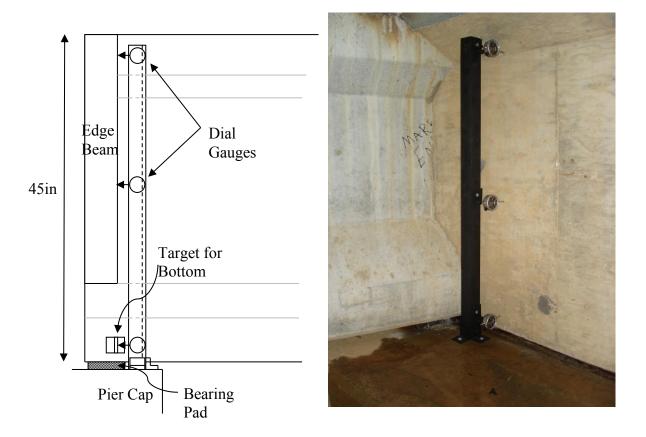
Dial gage system: Elevation diagram (left), Installed on Bartow bridge (right)
